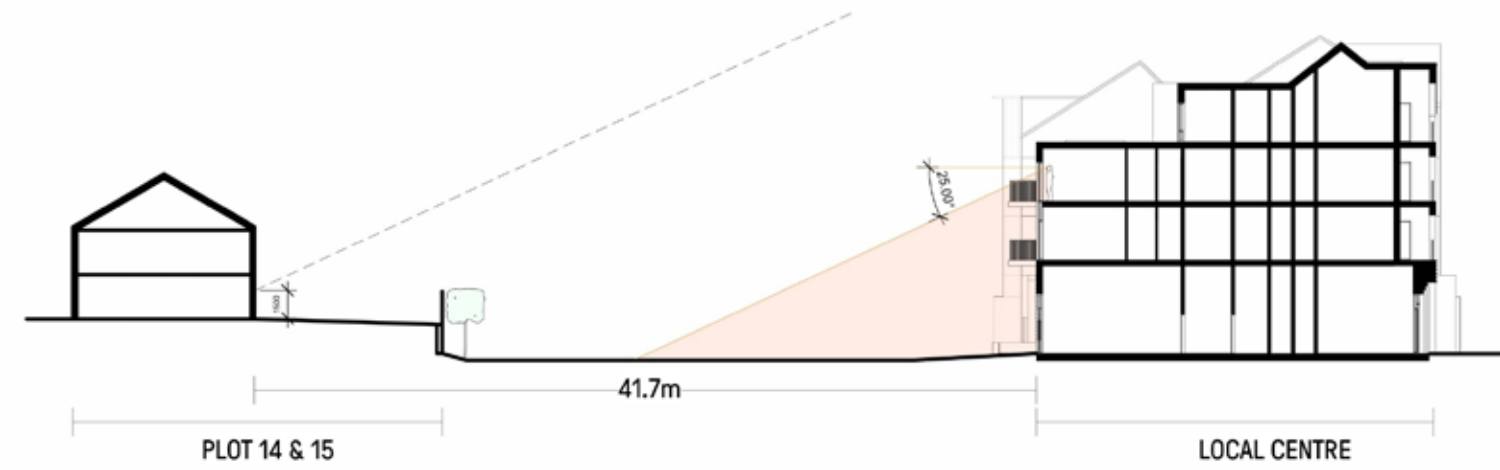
Local Centre & Plot 14 & 15 Second Floor Privacy Section prepared for Design Workshop
